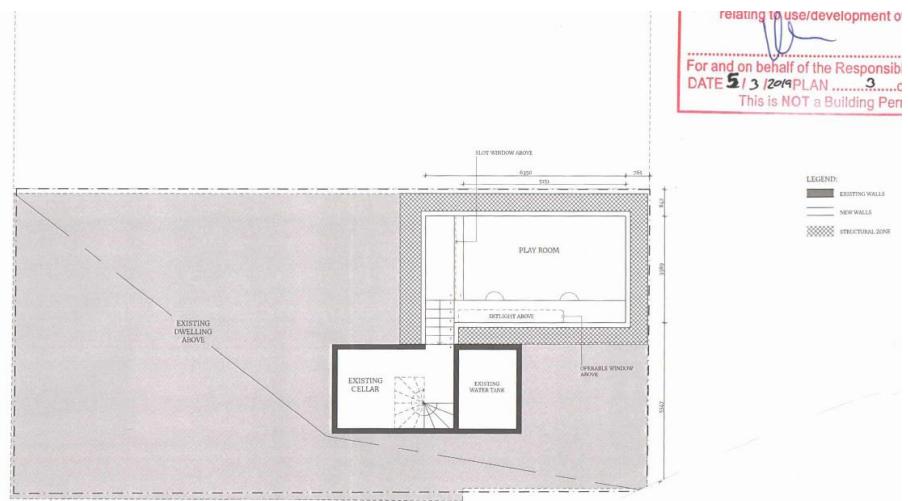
shows the approved basement level of the dwelling, as per the endorsed first floor plan for Planning Permit PLN18/0820.
